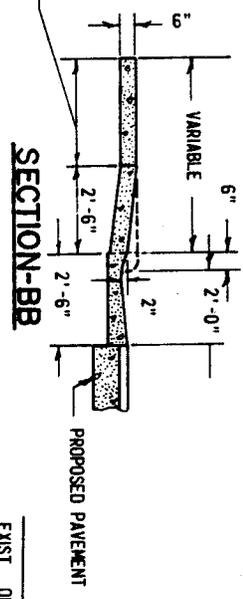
DETAIL OF PROPOSED DRIVEWAY PLAN
